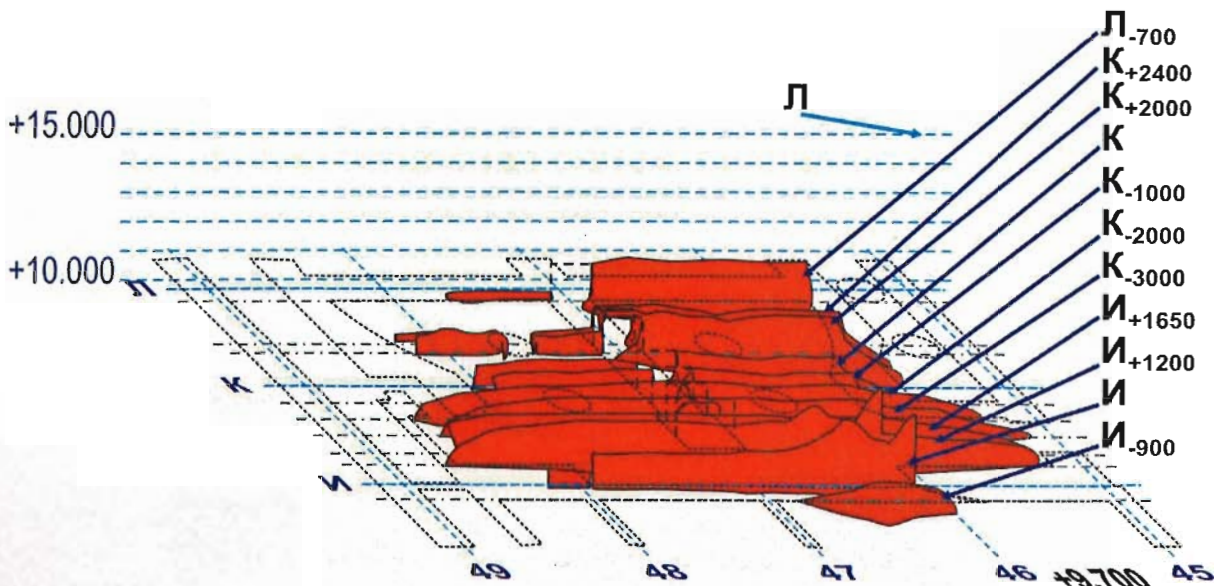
Room #305/2. LFCM. Layout of sections at +9.700 level mark
